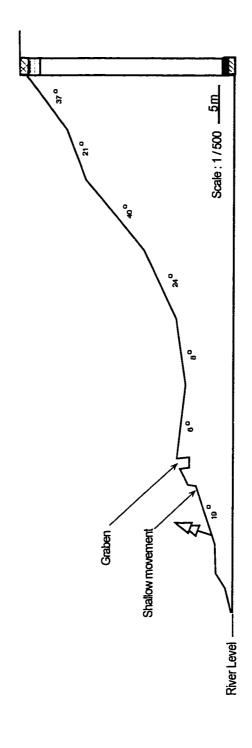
18 - Longitudinal Profile, P-16 B, at Loc. 16, (looking downstream)
